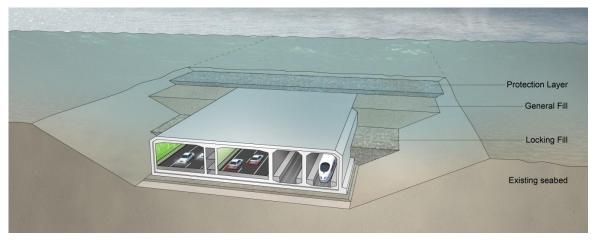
Cross section of dredged trench with tunnel element and backfilling
